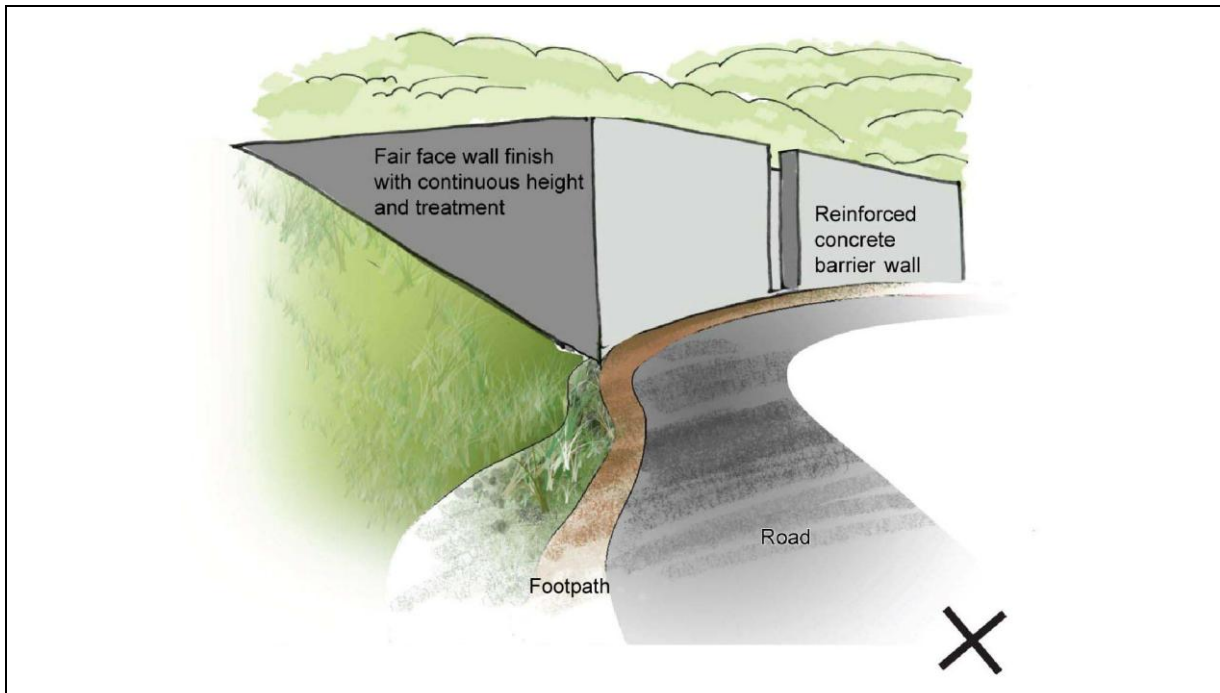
Fair Face Barrier Wall with Continuous Height
